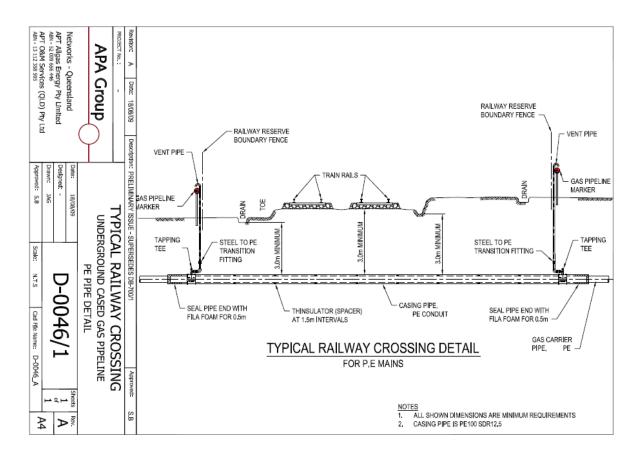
Enveloping pipe and venting arrangement for underground gas pipeline (APA Group)
